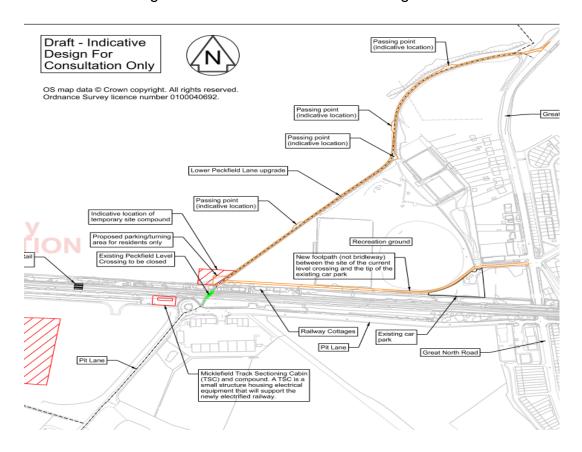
Option 1: New footpath and improvements to Lower Peckfield Lane (north of railway)
